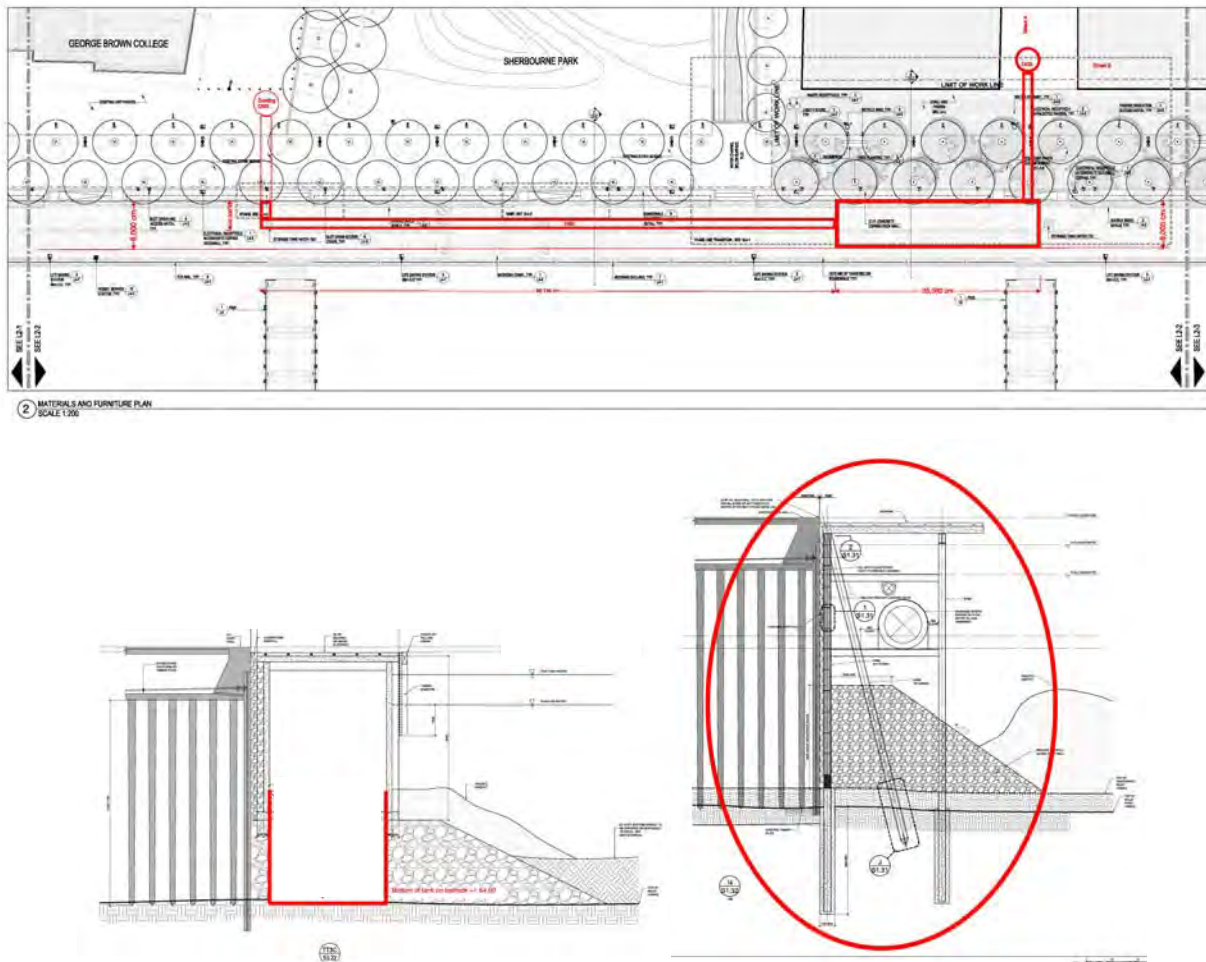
Plan and Sections for Dockside Storm Pipe / Tank
